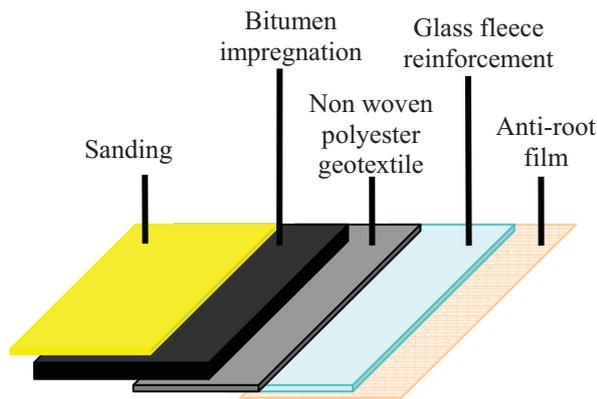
Typical cross-section of a BGM (adapted from Breul et al. 2008)
